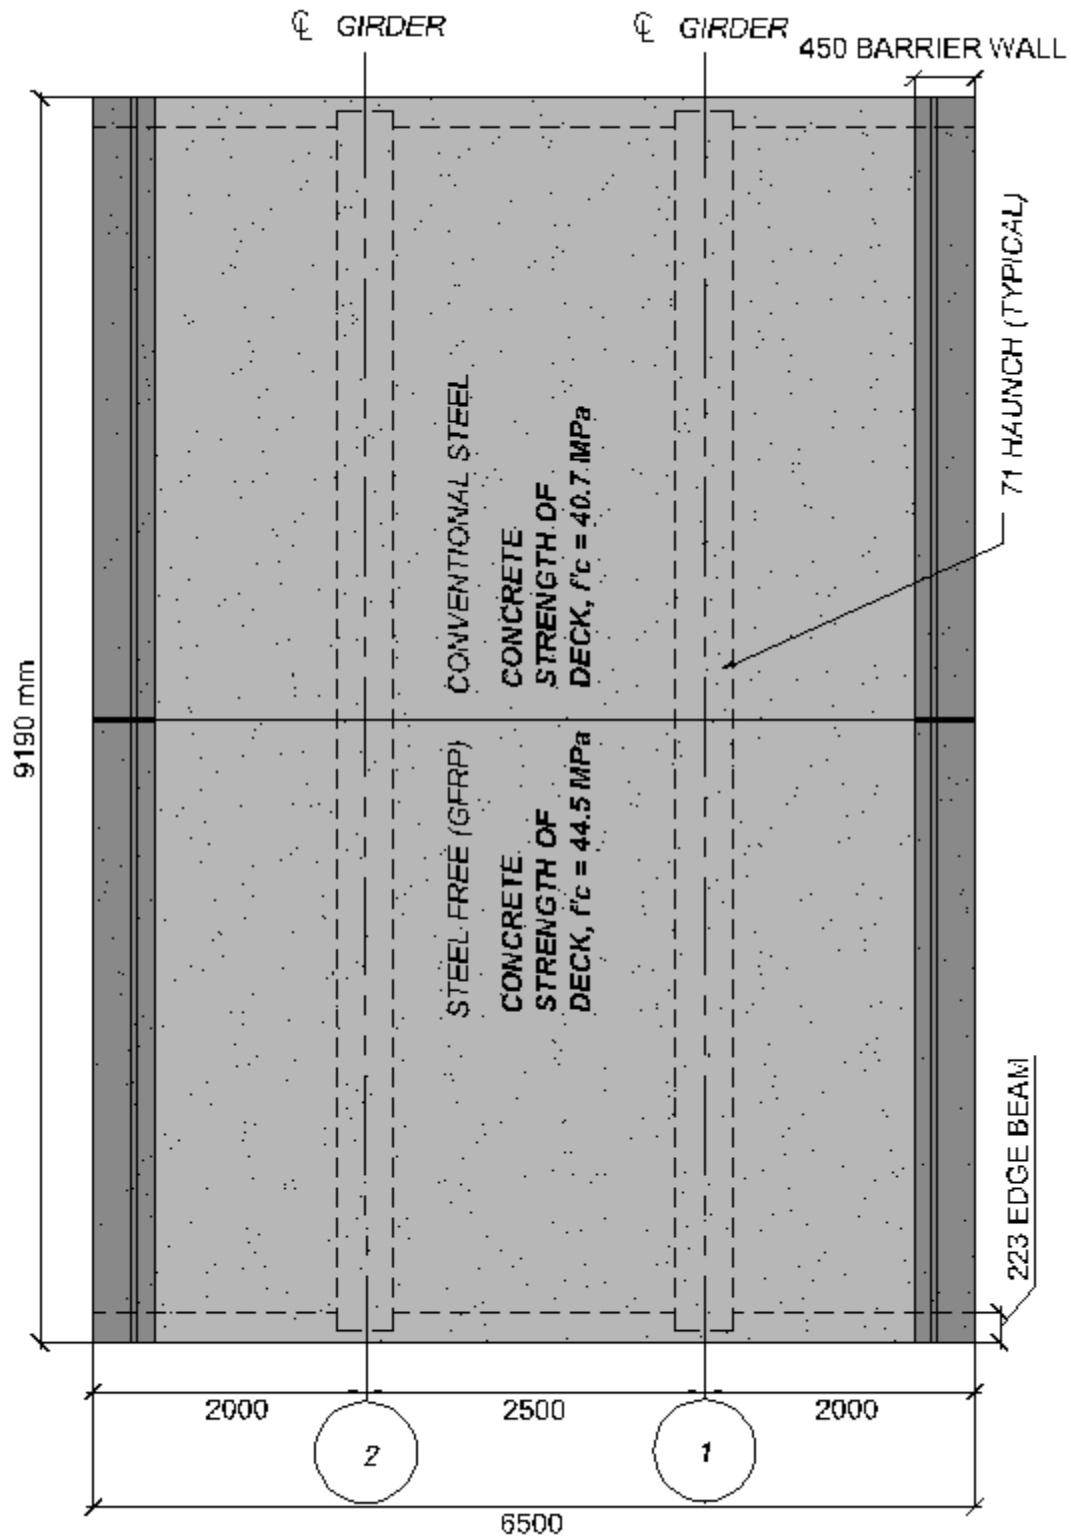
Plan view of concrete bridge deck slab schematic used in this experiment
